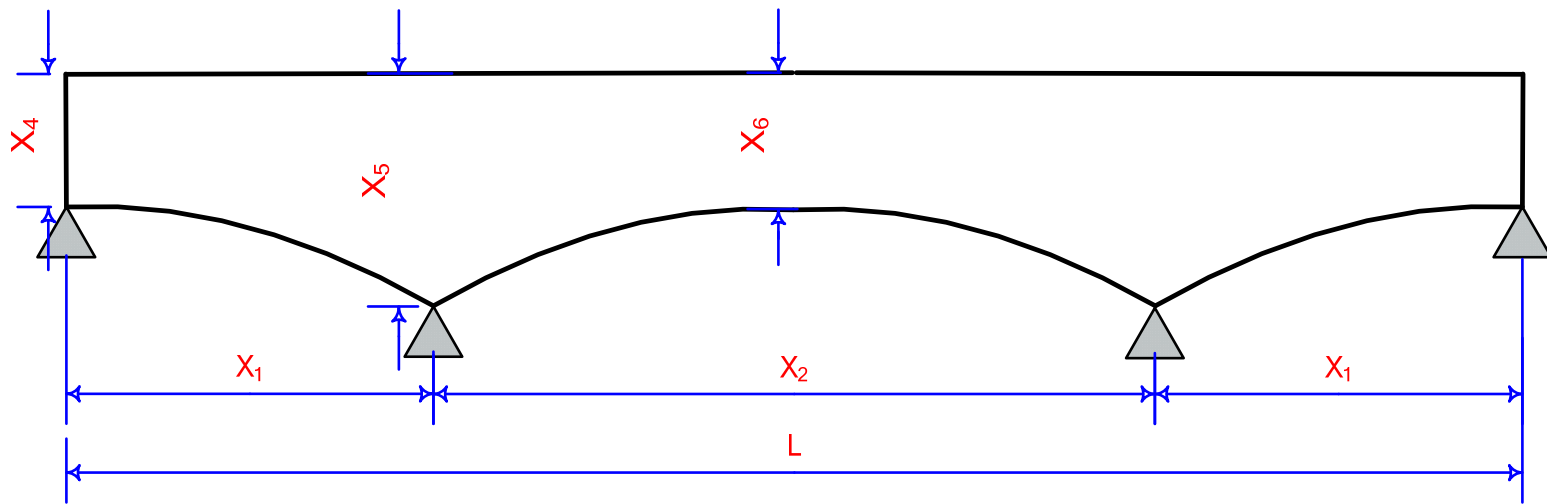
Design Variables in Cross-Sectional Dimensions and Structural Configuration of Three-Span Continuous Bridge girders
